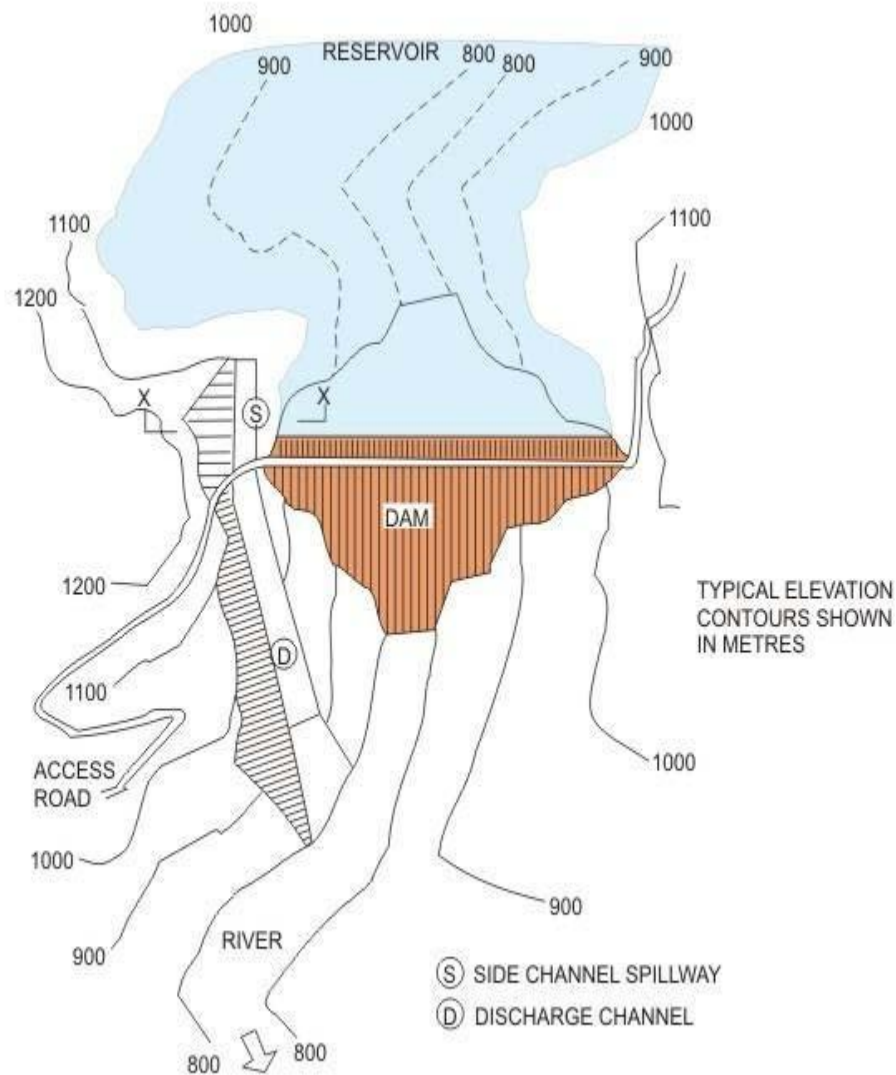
Plan of an embankment dam showing side channel spillway and chute channel
